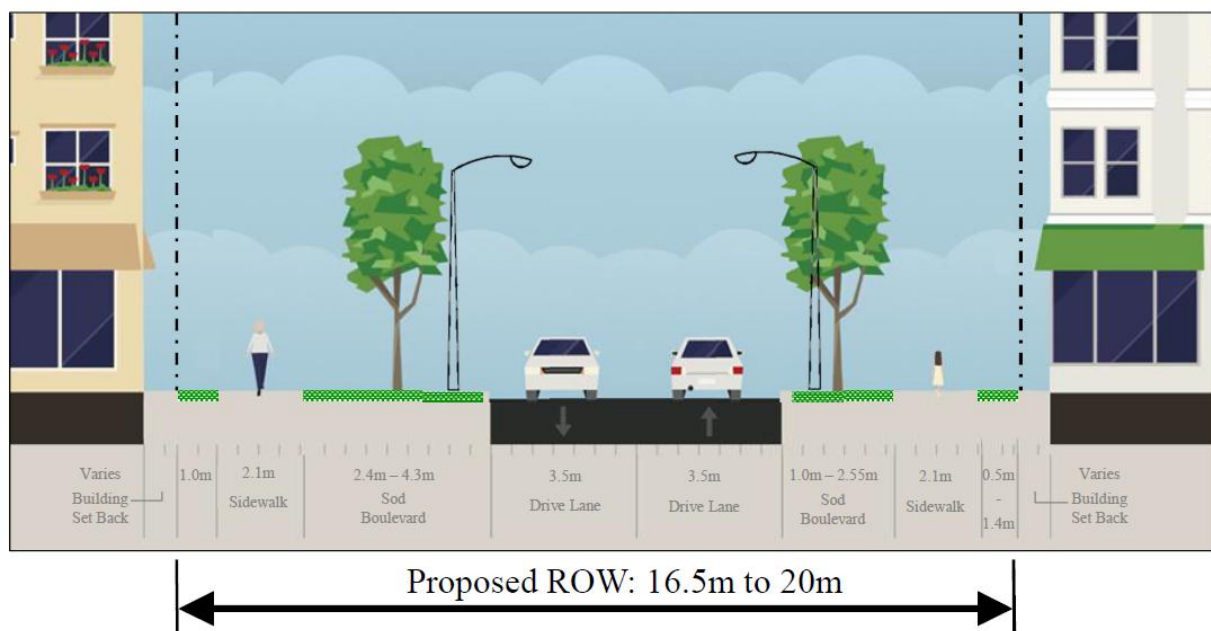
Typical Section - New east-west street (Kenaston Gardens to Barberry Place) (Facing East)
